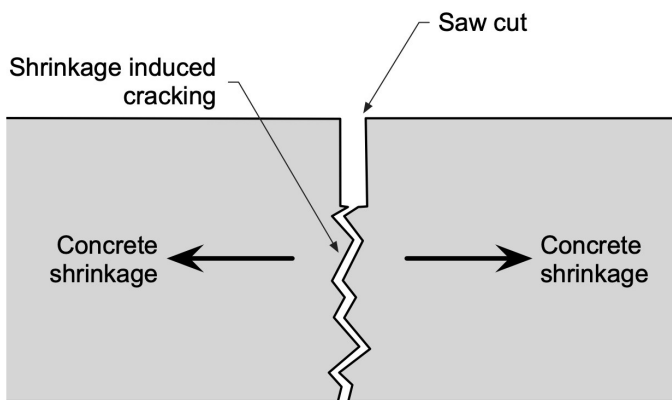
A crack-control joint example for a concrete slab-on-grade
